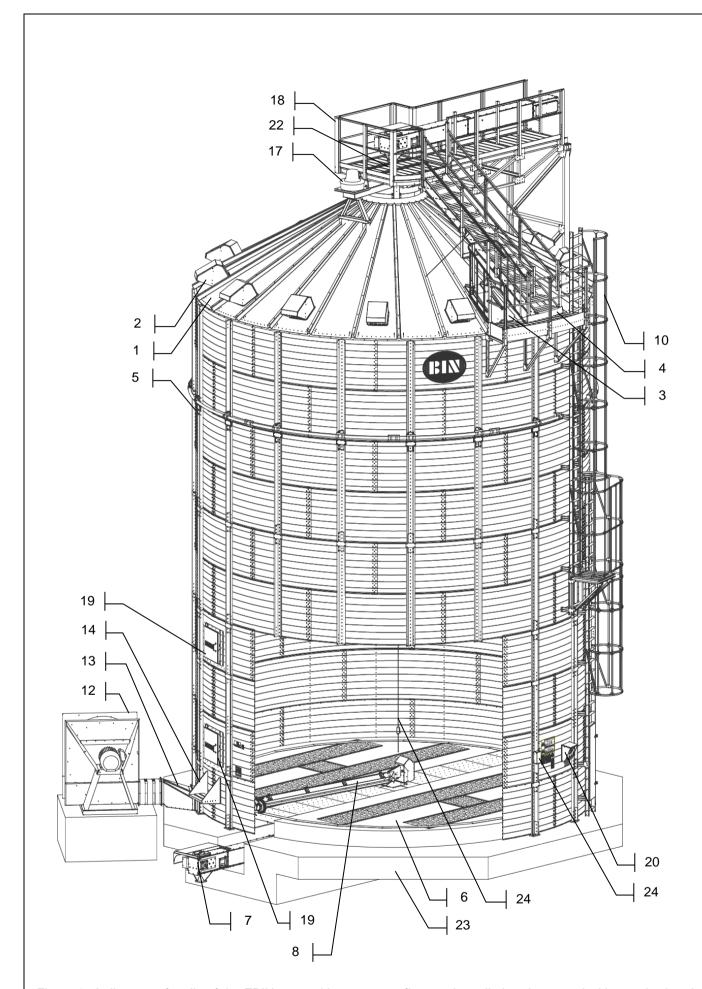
A diagram of a silo of the FBIN type, with a concrete floor and ventilation ducts, and with standard and optional equipment.
